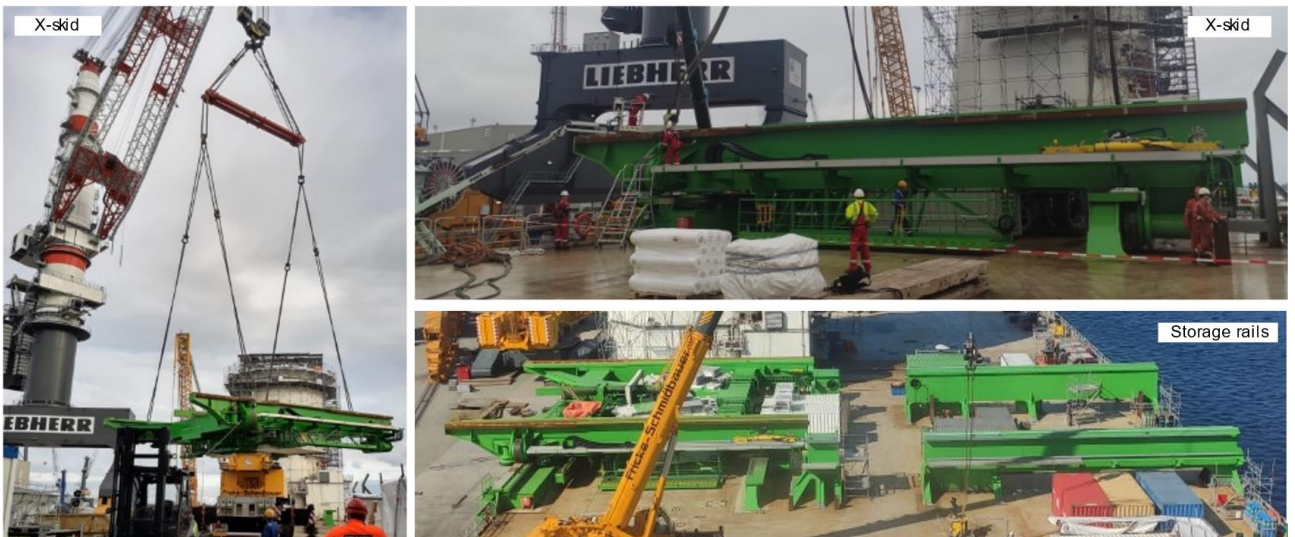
Assembly of X-skid and storage rails on ORION in Rostock
